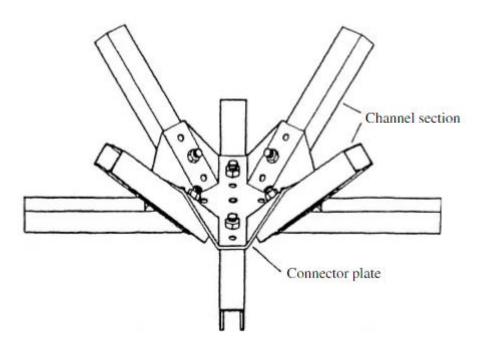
Sketch showing the Unistrut joint¹¹⁹
